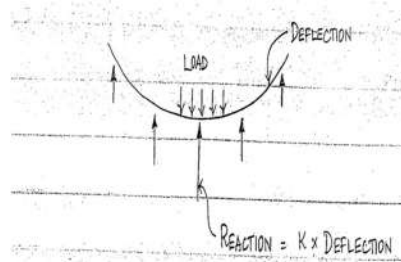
REACTION OF SUBGRADE UNDER CONCRETE SLAB
